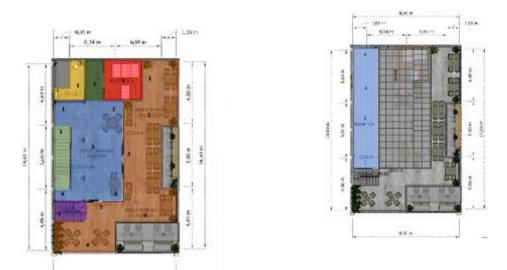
(left) Location of measurement point in third floor and (right) Location of measurement point in roof top floor
